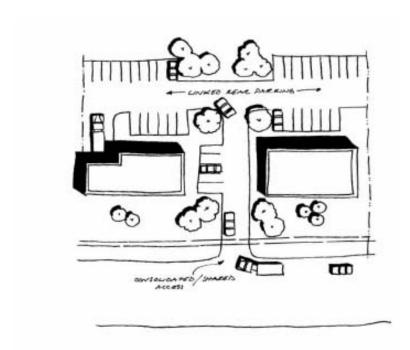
Large parking lots should be broken up with landscaping and pedestrian walkways. Also, linked adjoining parking areas are encouraged in order to further reduce the number of turns both on and off of the major roads and aid motorist access to adjoining businesses. The placement of structures such as fences and other barriers that prevent on site vehicular movements from one property to another is discouraged.
